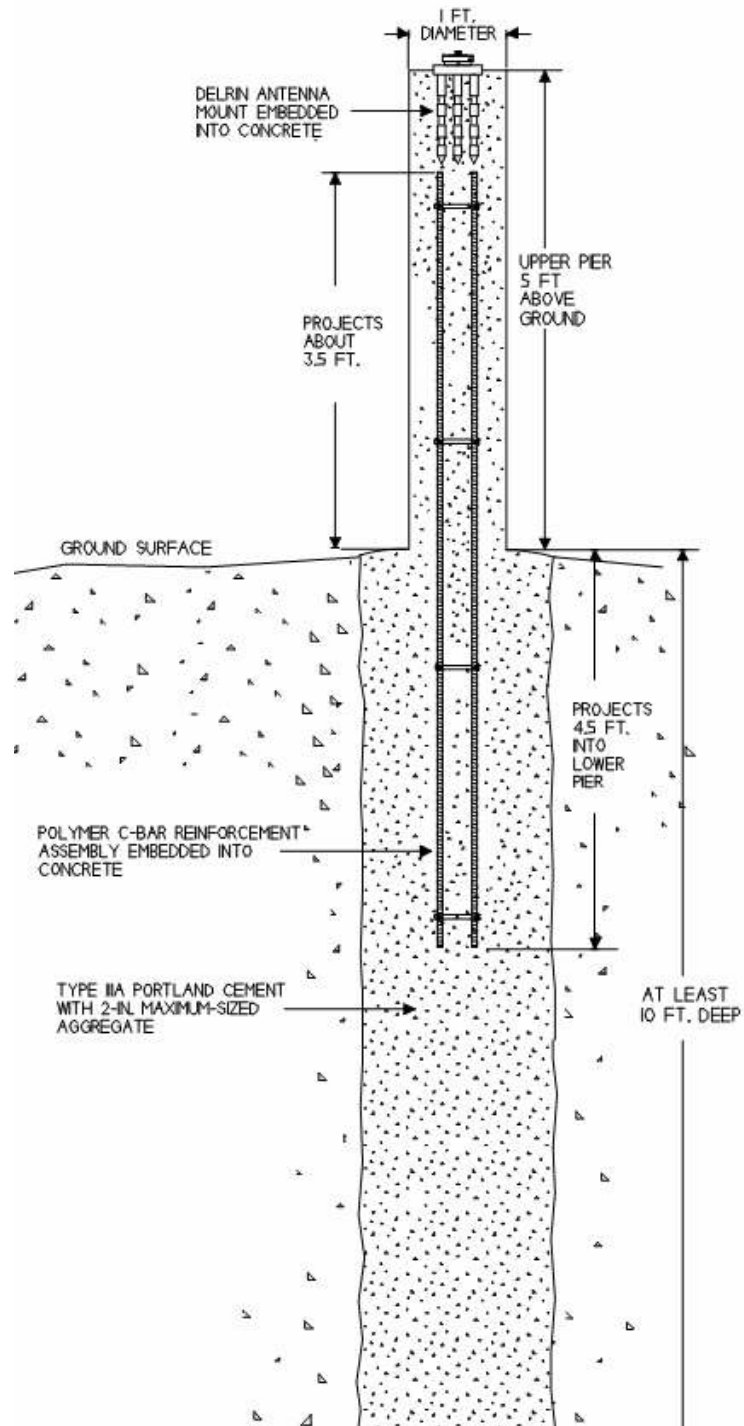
The sample drawing of a concrete pillar for soft ground (Muray, 2000)
